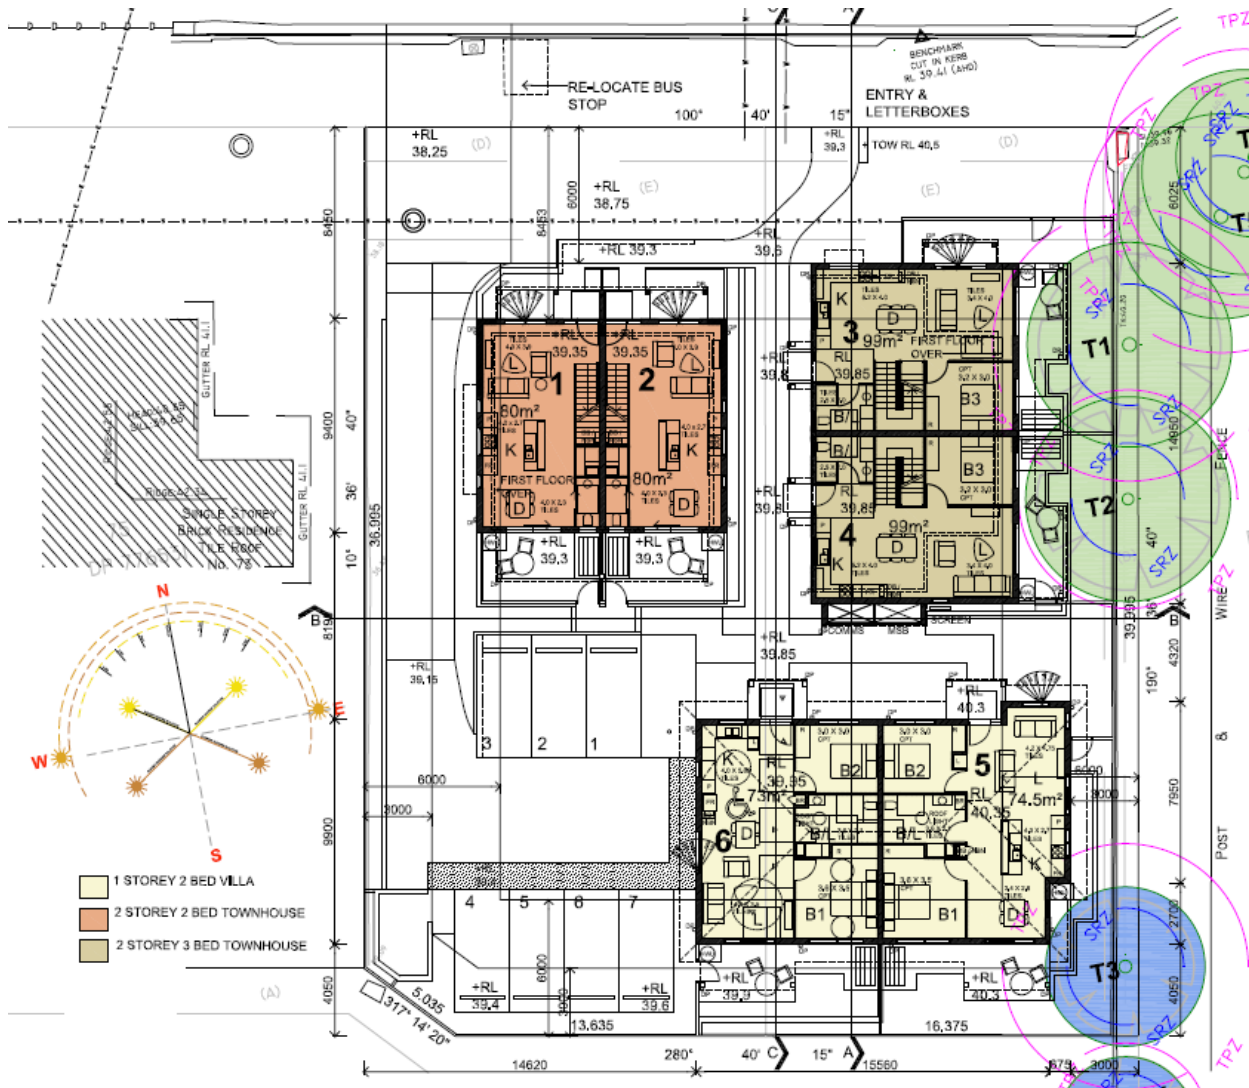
Extract from Architectural Plans – General Arrangement Plan – Ground Level (Source: Barry Rush and Associates, dated 03/05/2023)
